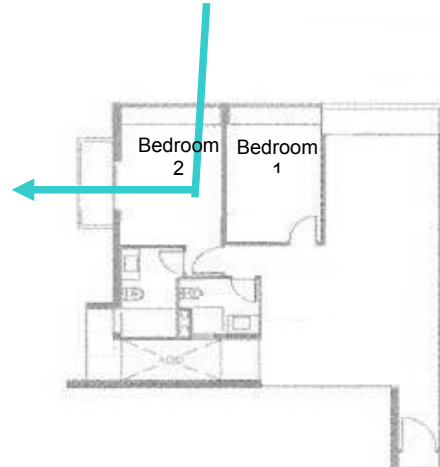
Dwelling unit layout showing only bedroom 2 is considered to have true cross ventilation. Living room and bedroom 1 are not considered meeting the requirement 1-2(a) Option 2(i)
